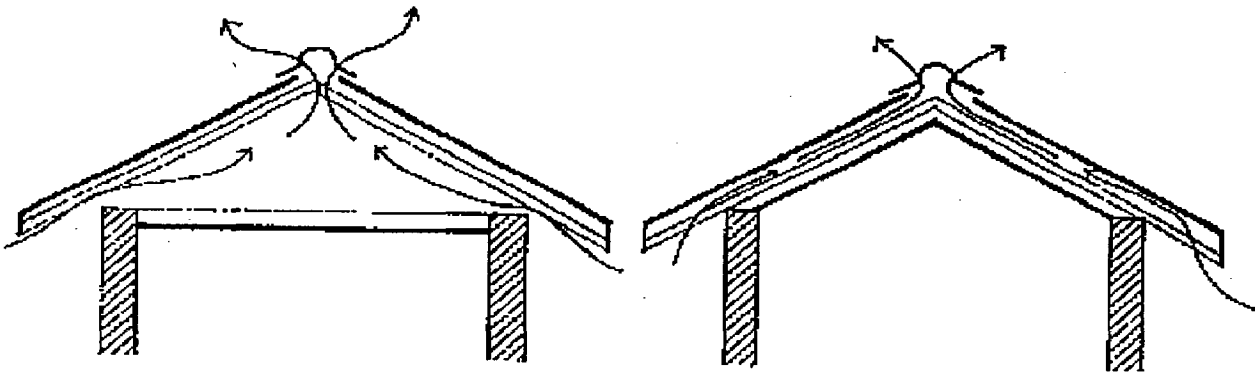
Placement of ceiling horizontally or along the roof slope
